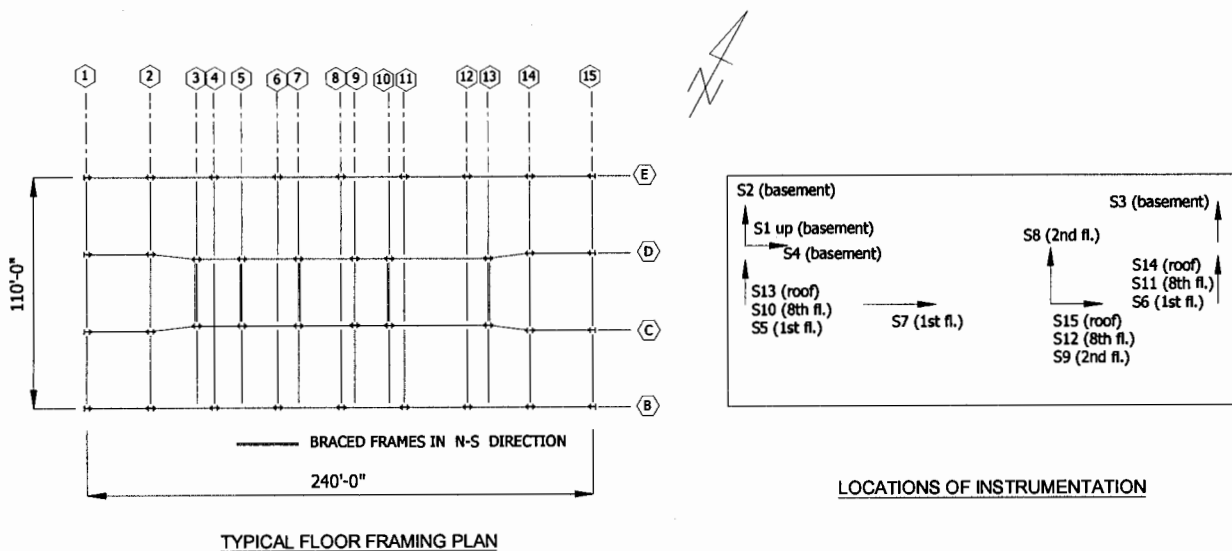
Typical Plan View and Instrumentation of 19-Story Building
